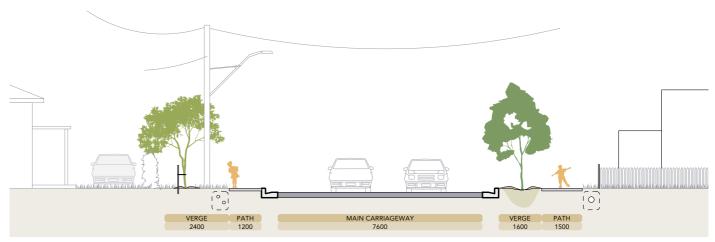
Typical local street and subdivision condition section. Source: RealmStudios
